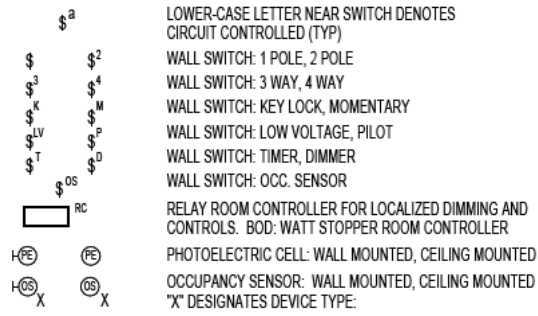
Example Lighting Floor Plan Switch Identification
